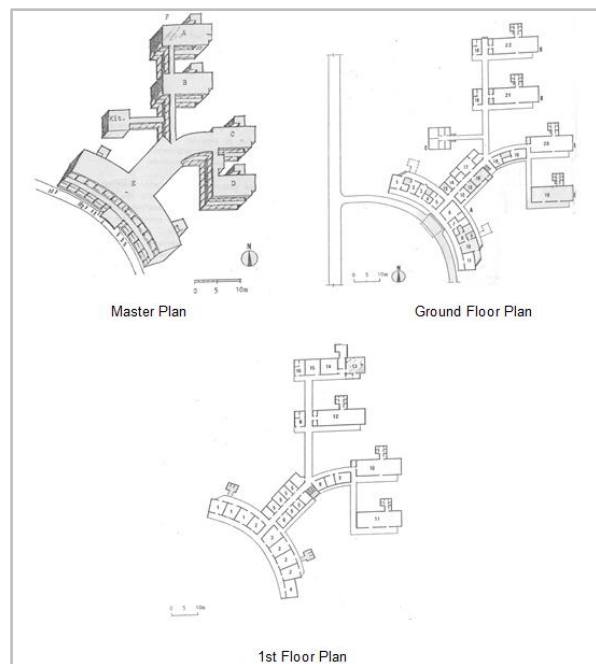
All Floor Plans of Hospital 'B' (Hussain, 1988)
